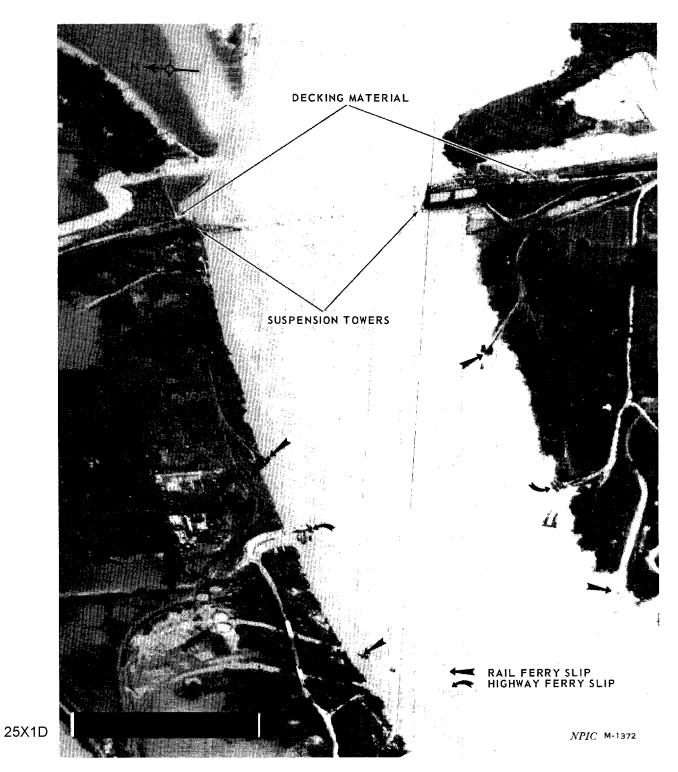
SUSPENSION CABLE BRIDGE OVER THE SONG LO, VIET TRI AREA, NORTH VIETNAM
